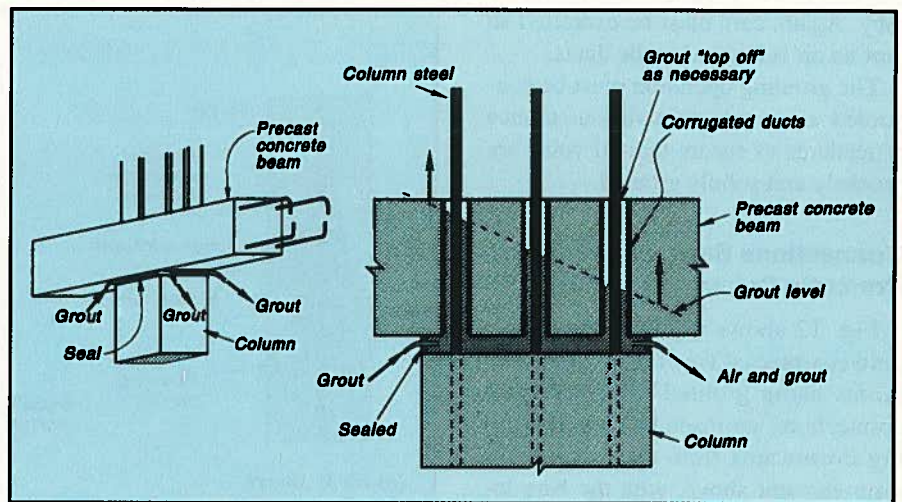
Grouting of a beam-to-column joint (Ref. 3).
